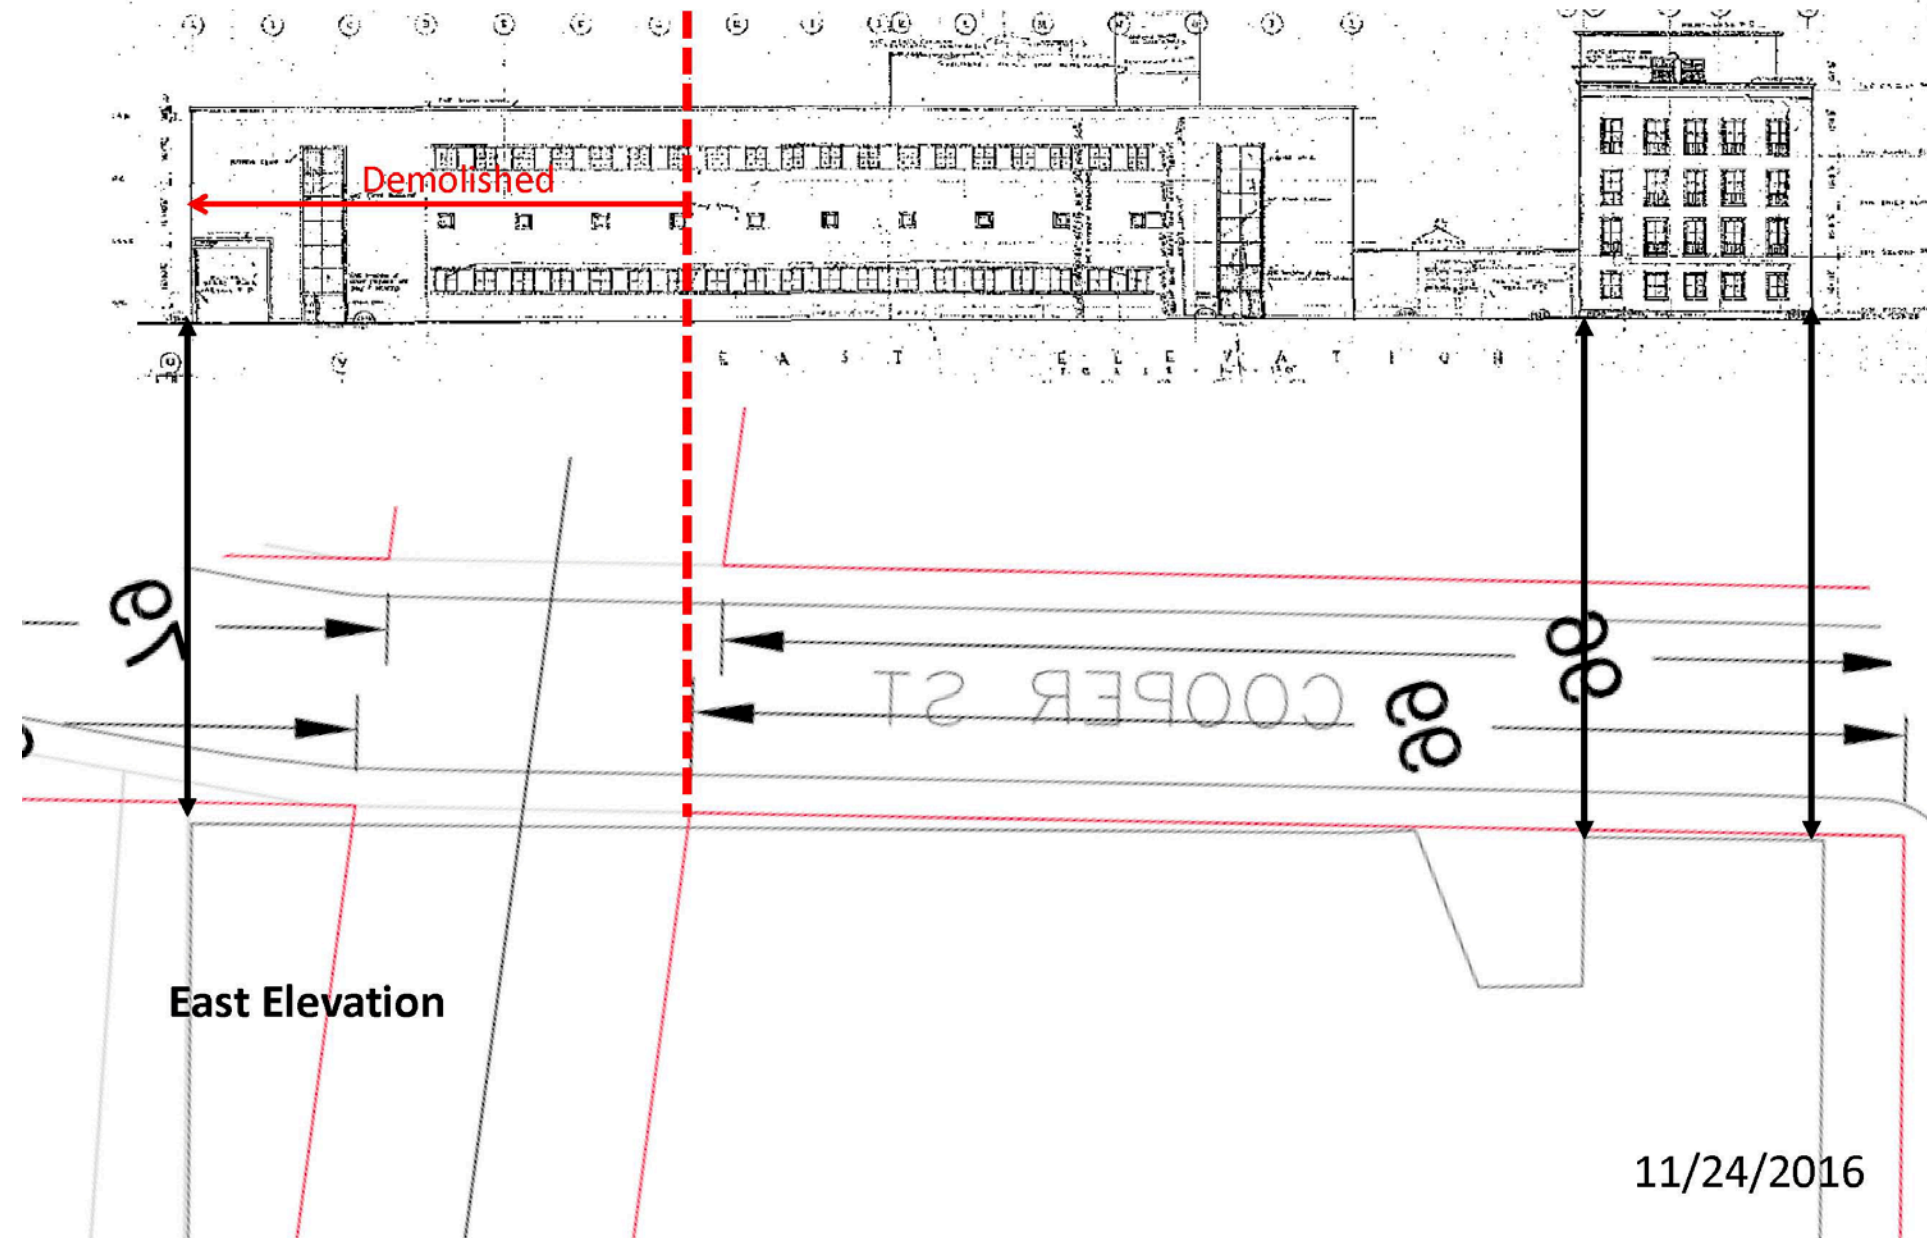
Transportation Master Plan Road Alignment Impact, east elevation
